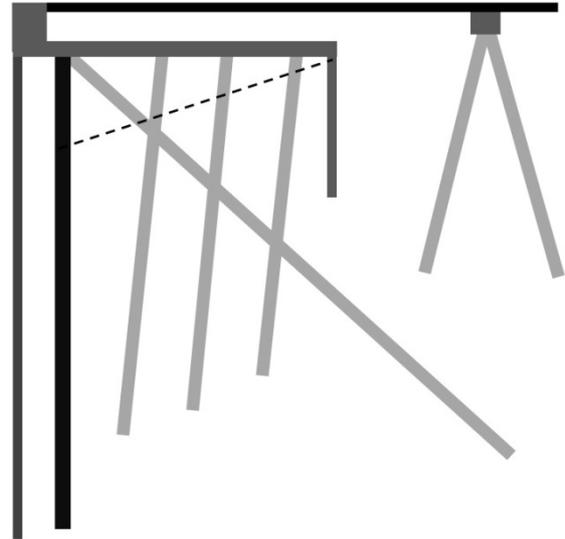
Sheet pile structure as a typical quay wall construction in German harbors (Principle sketch)
